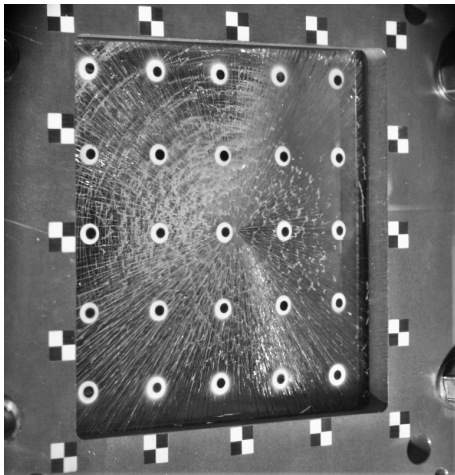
Fracture progress of the front pane in test LG-9.6-02.
